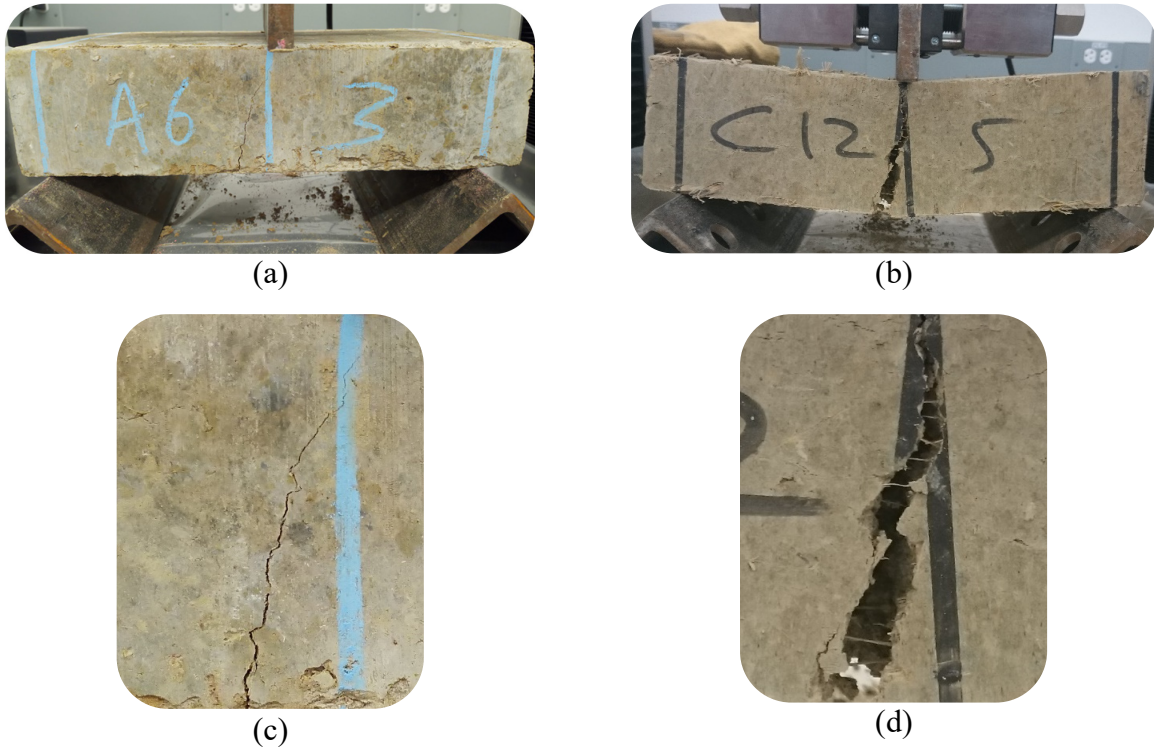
Failure and crack pattern of earth blocks under three-point flexure test: (a) global view of EB-00-00, (b) global view of EB-12-05, (c) zoom view of the crack in EB-06-00, and (d) zoom view of the crack in EB-12-05.
